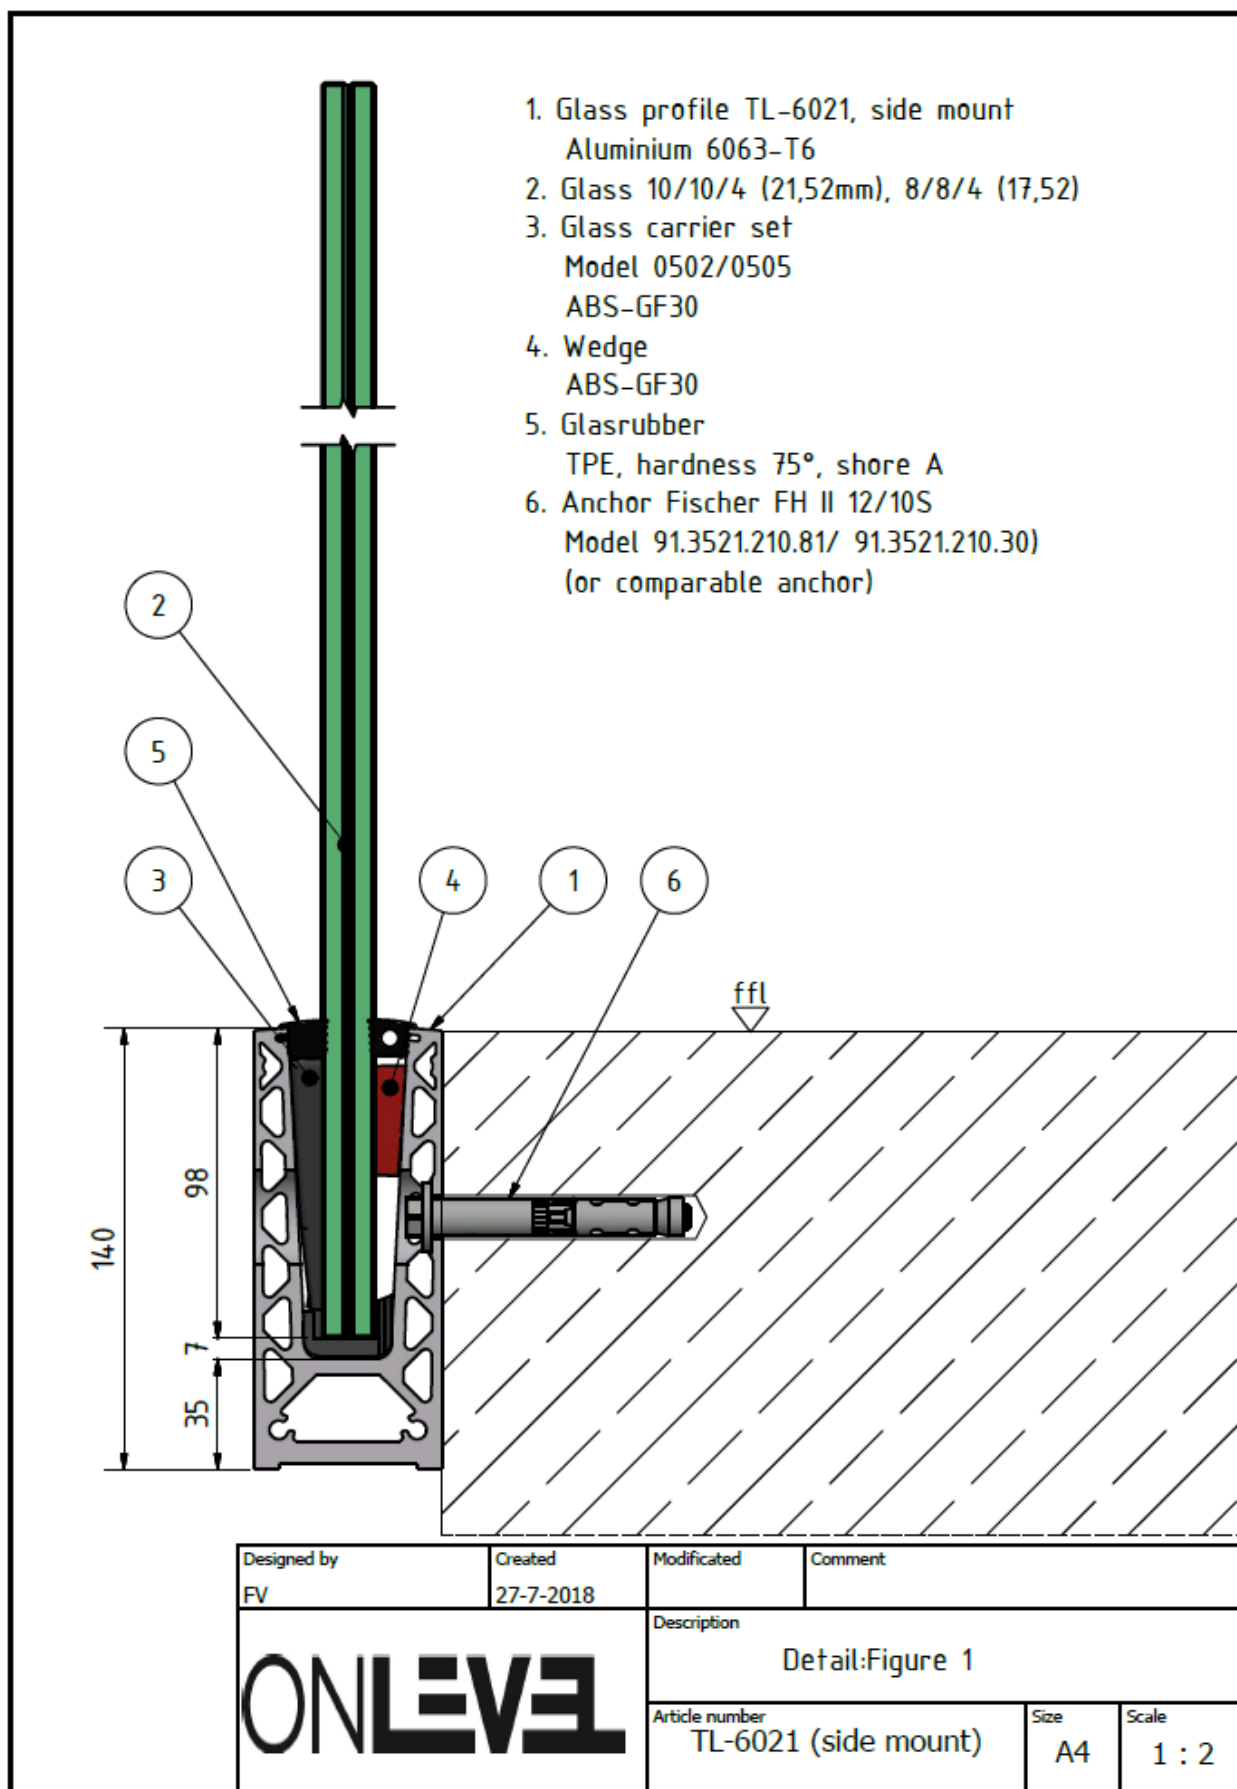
5. Product drawing from OnLevel for profile 6021 Side Mount – 1.5 kN/m, sheet 1 of 4.
